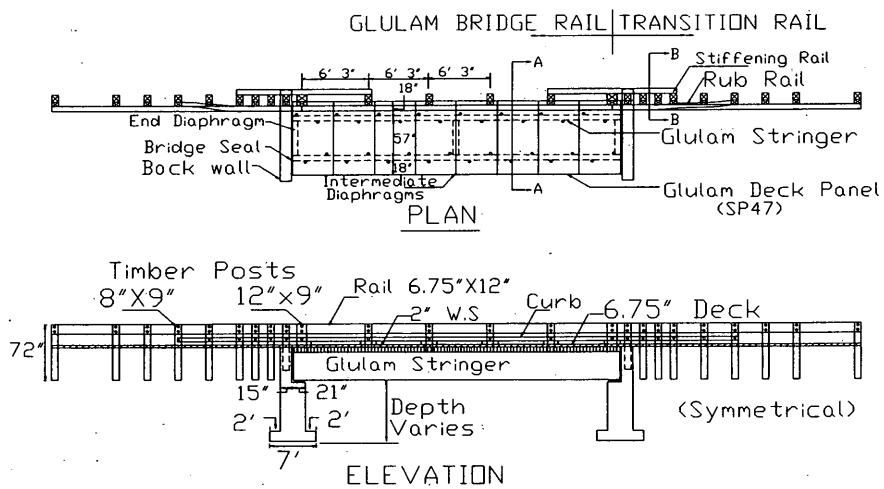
Timber Bridge Rail System 1 for PL-1: details of transition rail.
